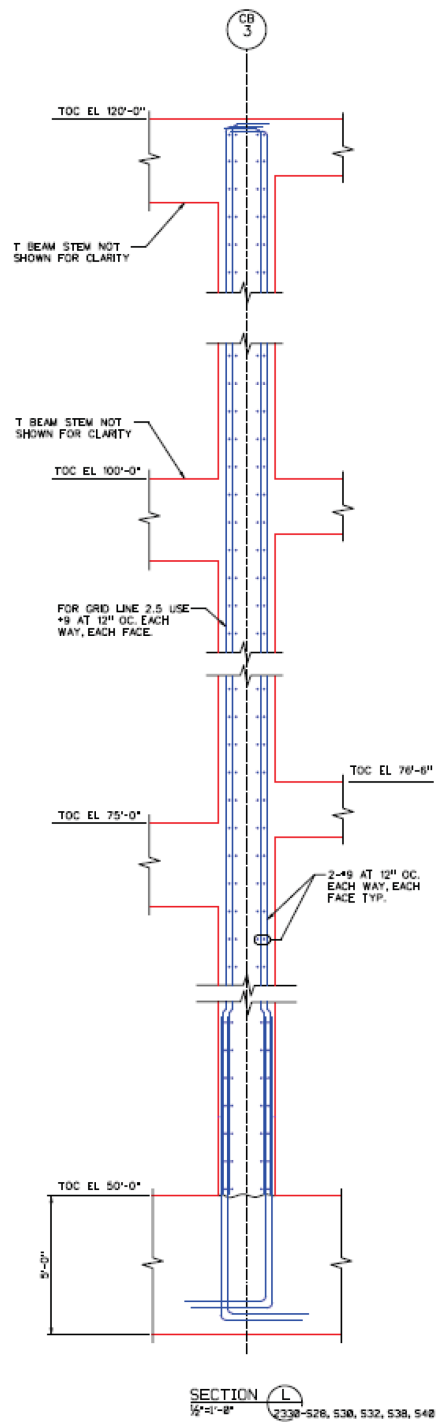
B-67: CRB Reinforcement Section View of Wall on Grid Line 3
